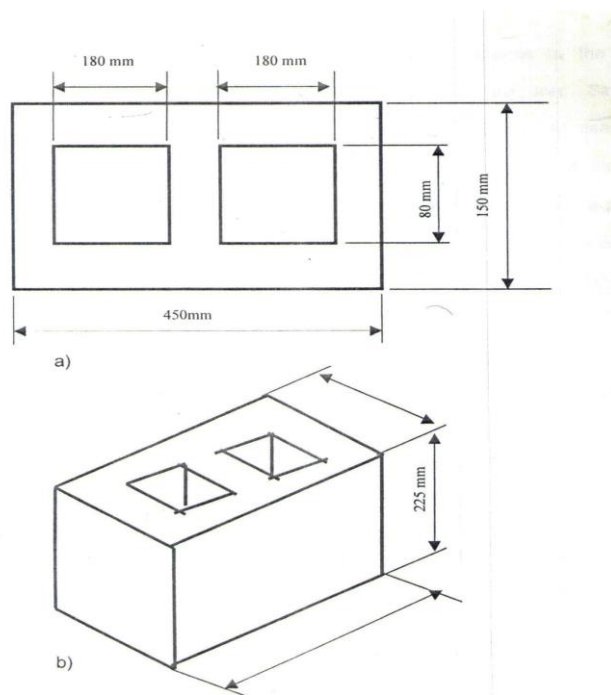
Dimensions of prototype Sandcrete Block unit (a) Plan view (b) Isometric view
